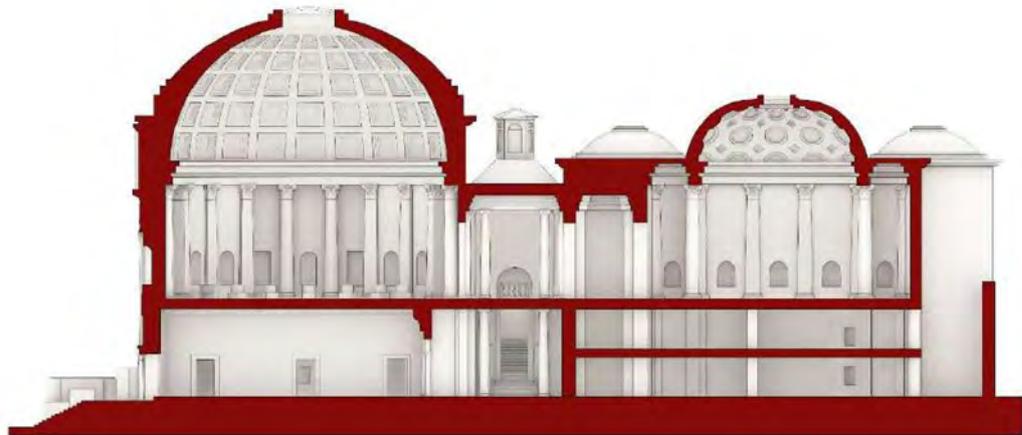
R. Adam. Section of Kedleston Hall, 1759.
